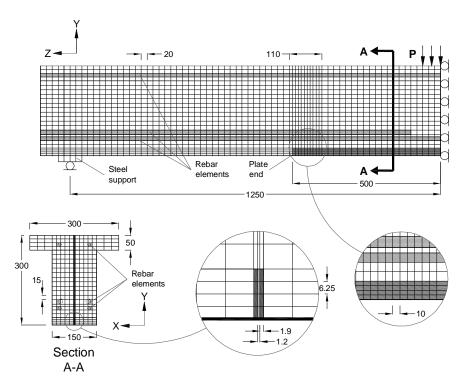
Typical finite element model of Hassan and Rizkalla's beams (all measures in mm)
